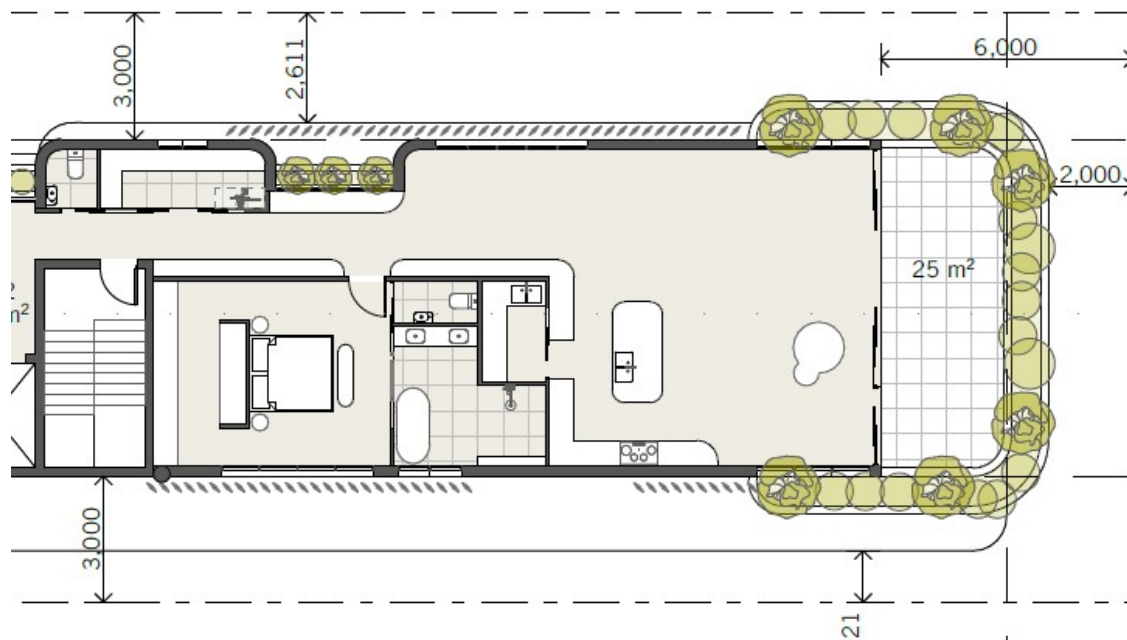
Partial level 2 floor plan (Source: Lightwave Architecture)
